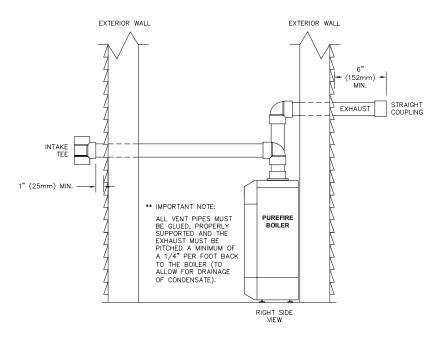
Exhaust and Air Inlet on Opposite Walls
